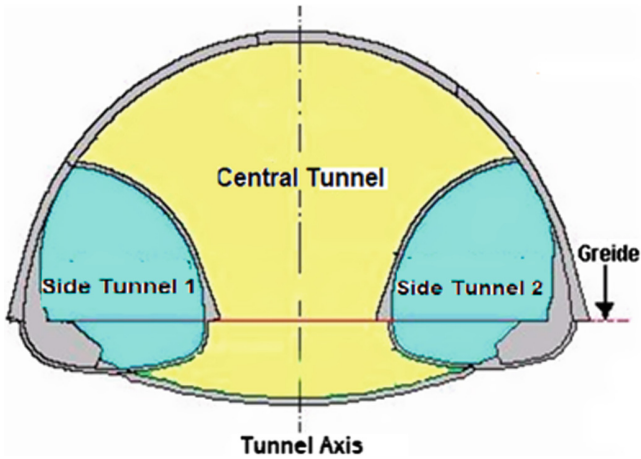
Staged construction of tunnels of the “São Paulo Rodoanel Highway” [2]
